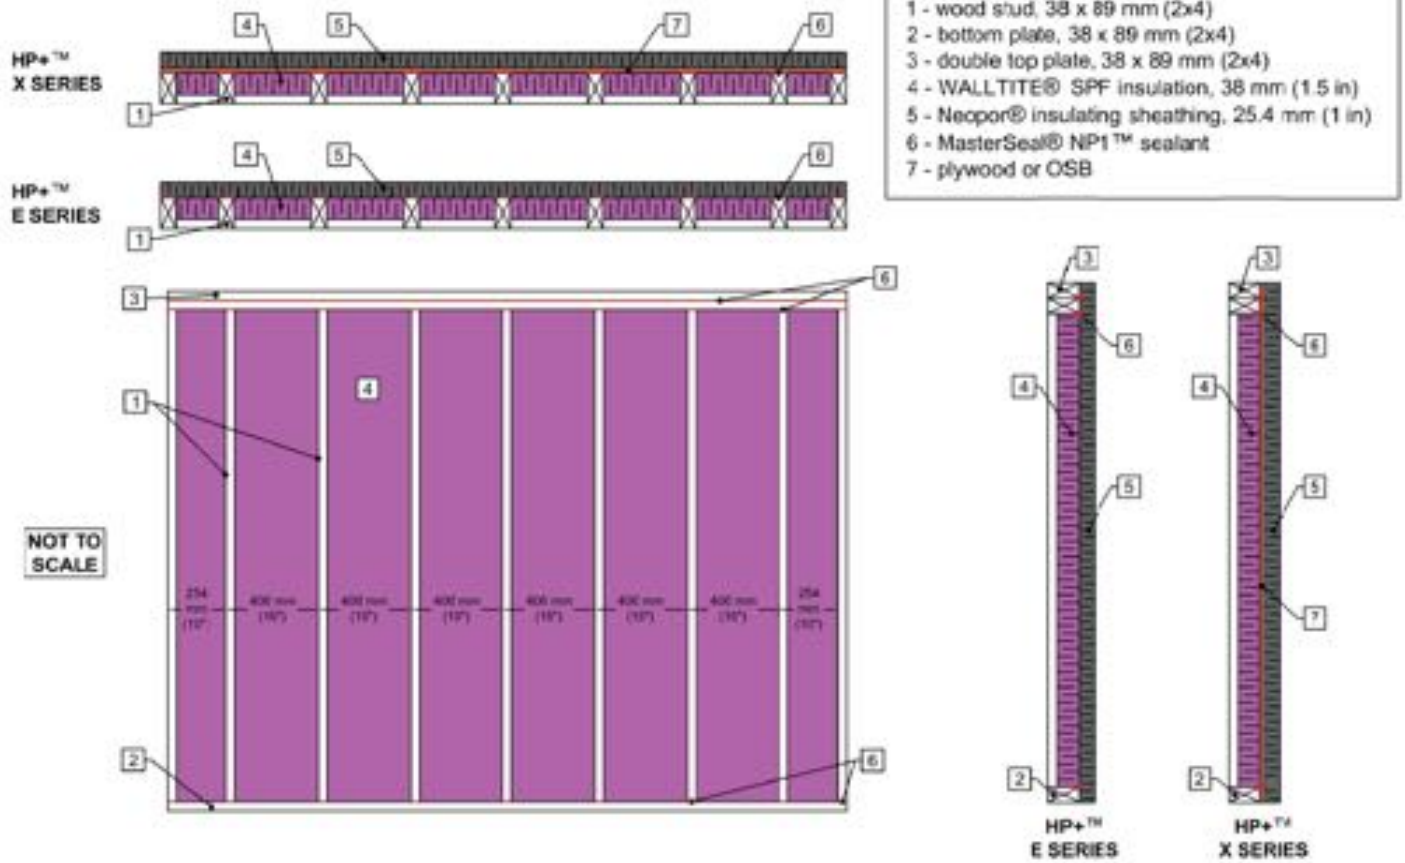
Tested wall specimens “HP+™ E and X Series” opaque wall
